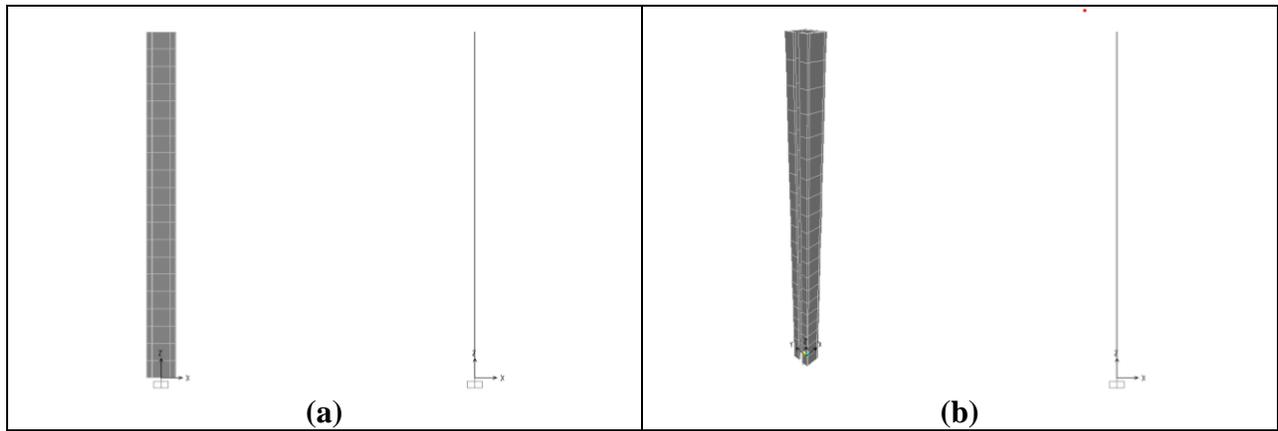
(a) Single column model of planner wall; (b) Single column model of core wall with opening
